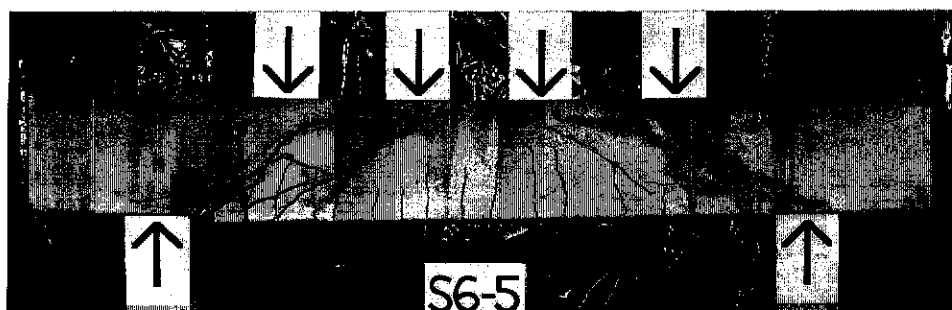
Crack Pattern of the Back Face of Beam S6-5
